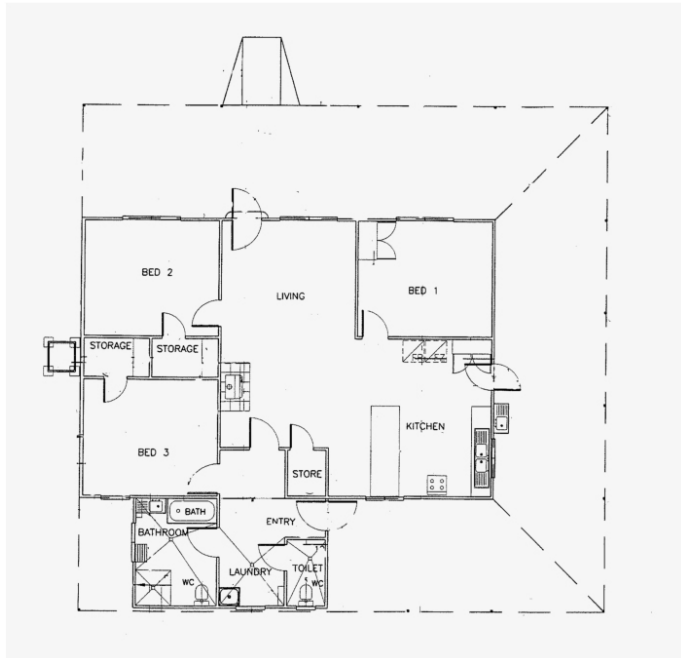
Standard 3 bedroom house plan built in Mimili in early 2005
